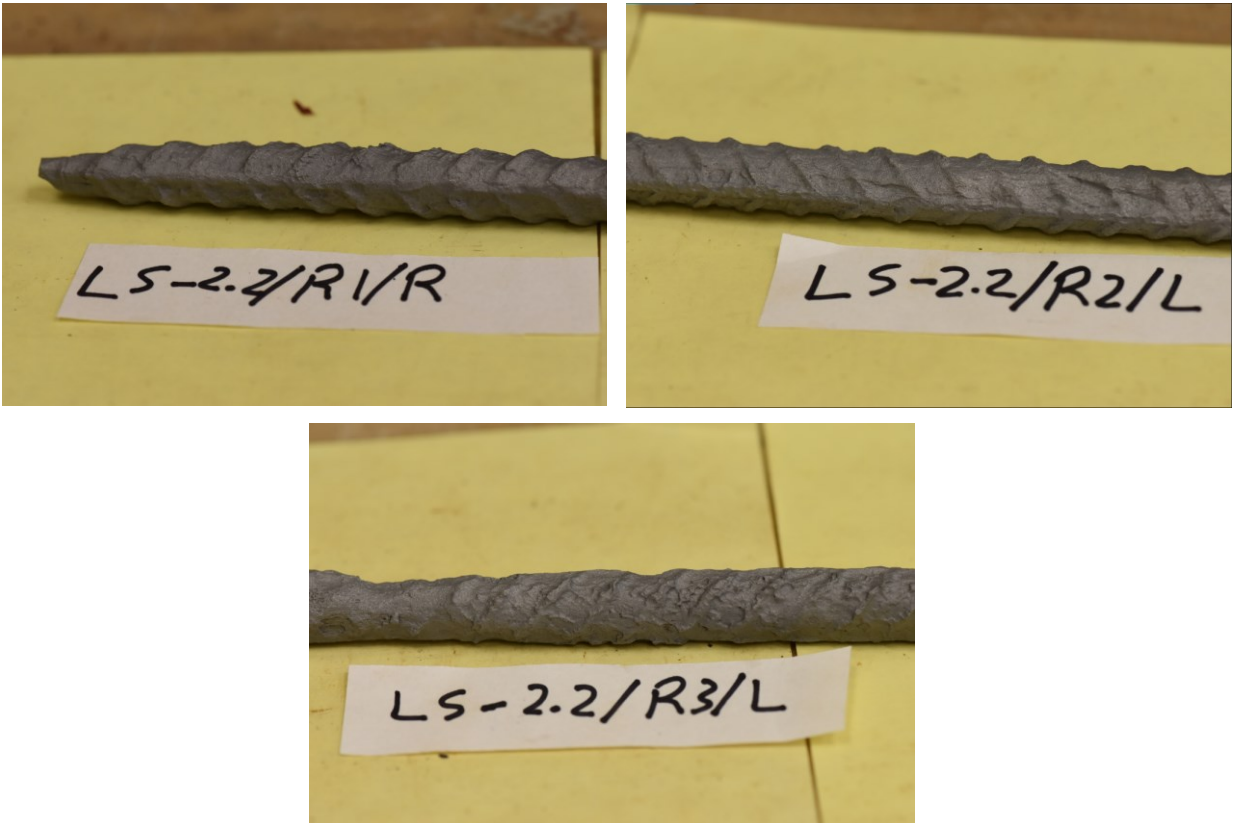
Corrosion patterns on the clean surface of steel reinforcement – beam LS-2.2
